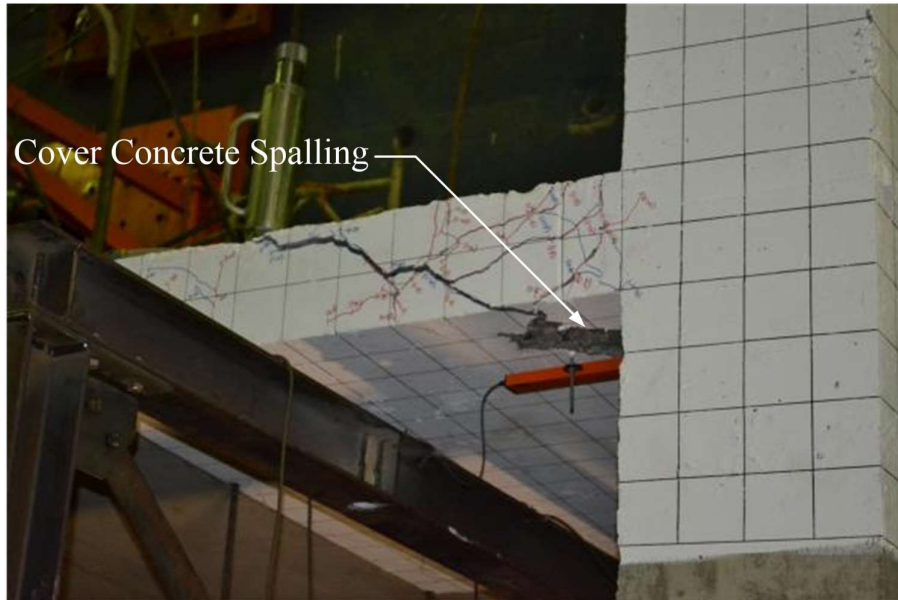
Cover Concrete Spalling on the Bottom Surface of the Slab
